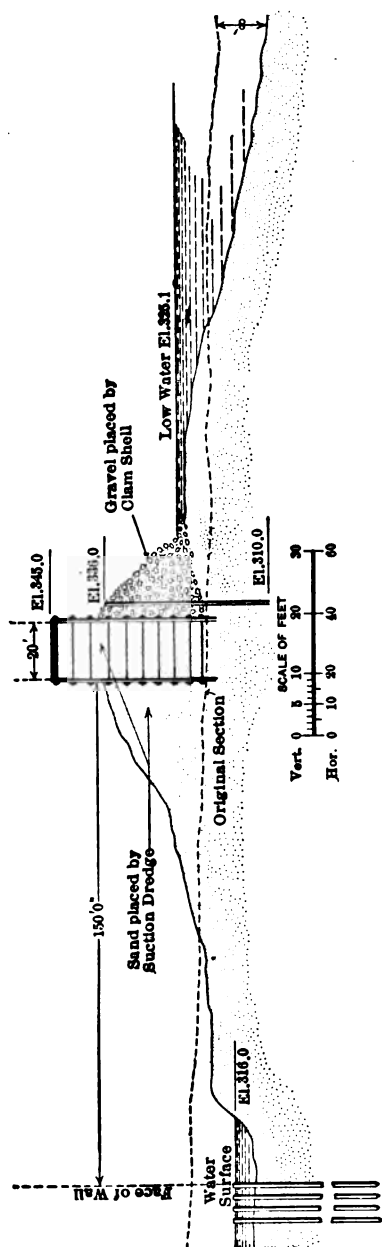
TYPICAL SECTION OF COMPLETED COFFER-DAM. DAM No. 48.
